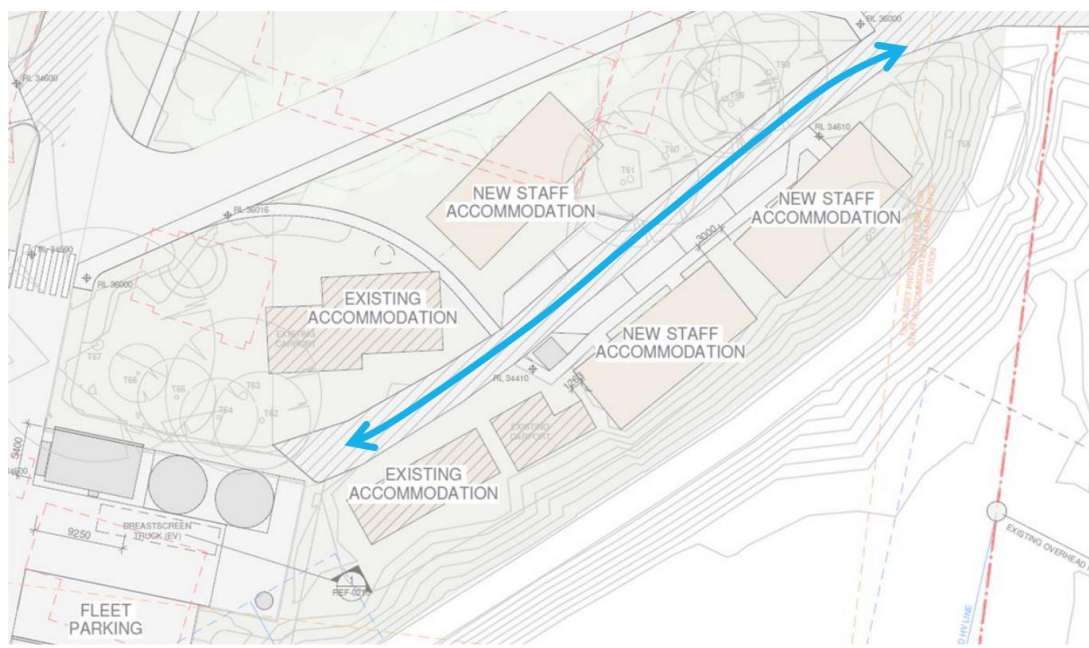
Proposed staff accommodation and access (SCT Consulting)
